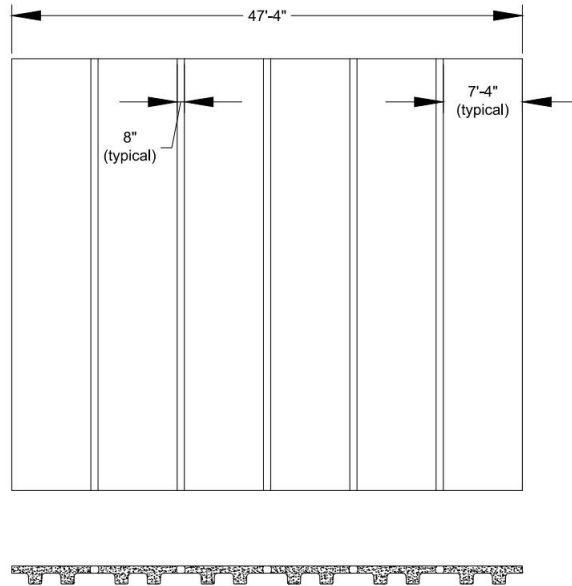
Dimensions for the 40 ft. span NEXT-8 bridge model
